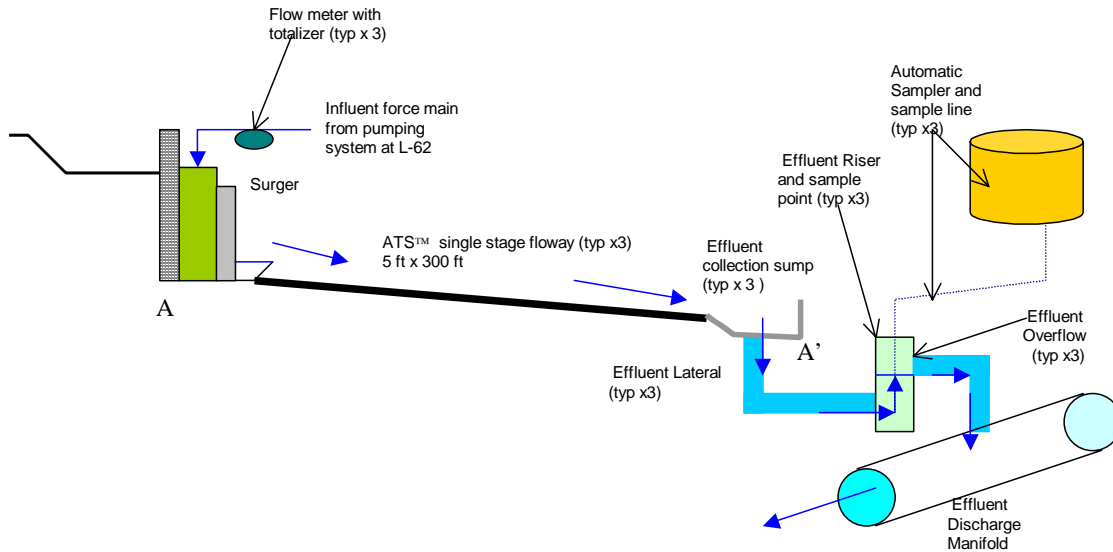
Section A-A' single stage ATS™ floway: drawing not to scale
